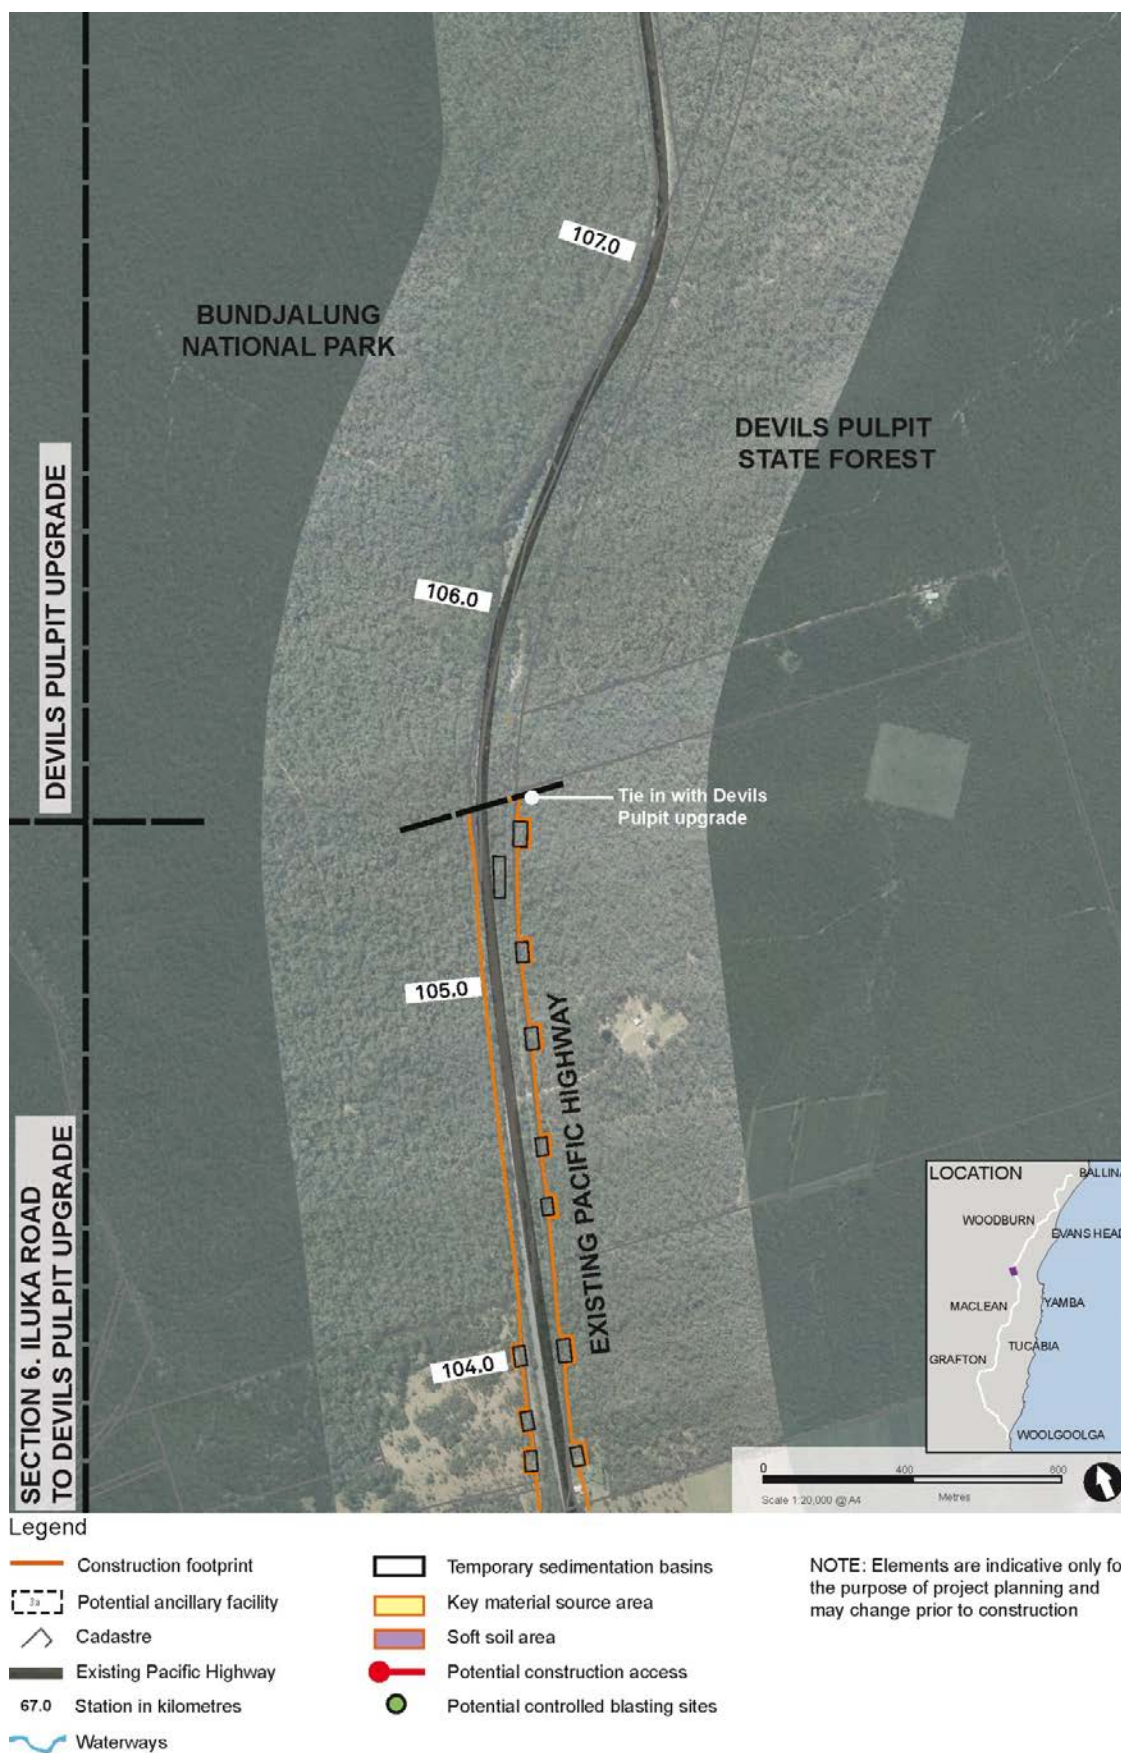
Extent of construction and construction features Section 7 (Station 103.7 to 107.6)
